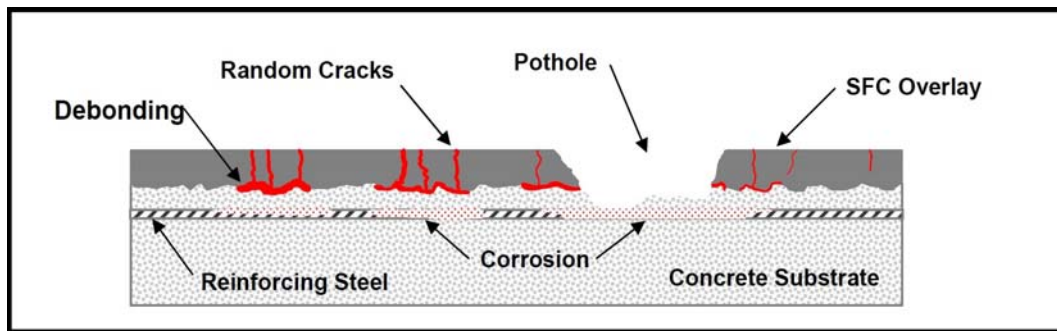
Cross section of bridge deck and overlay, description of issues.
